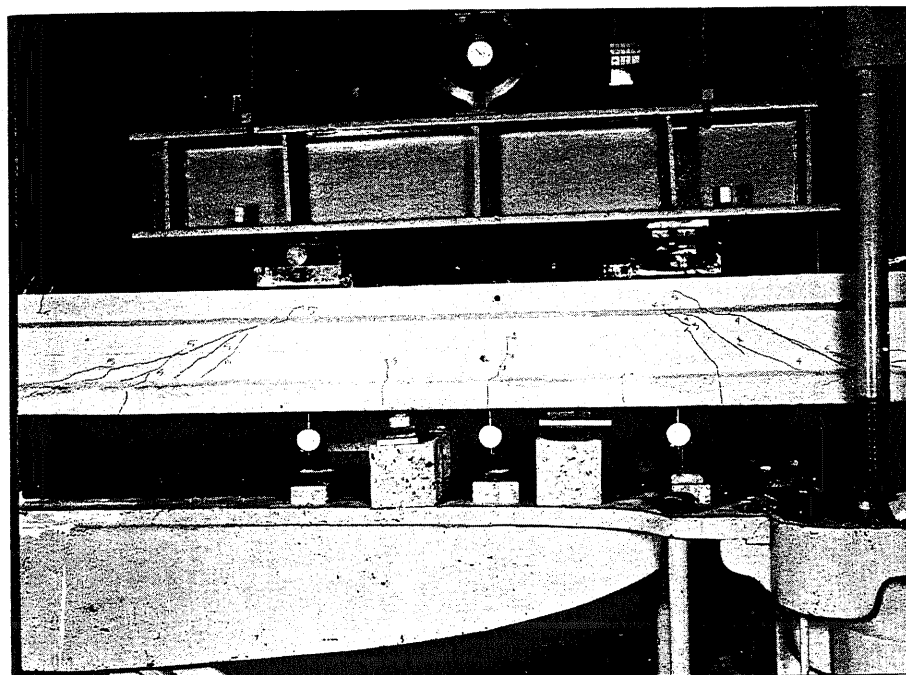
INCLINED TENSION CRACKING IN BEAM C.22.39
